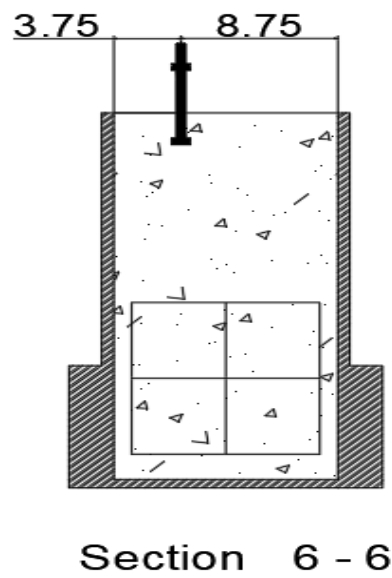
Specimen Sections (6-6), all dimensions in inch.
